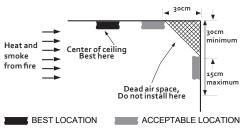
RECOMMENDED BEST & ACCEPTABLE INSTALLATION LOCATIONS
